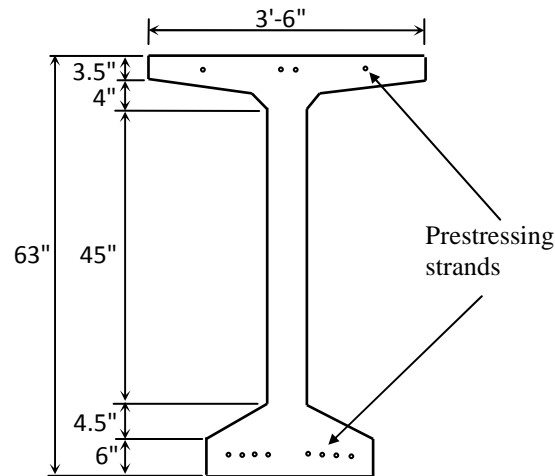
The cross-section of the BT-63 specimen and the layout of the prestressing strands.
